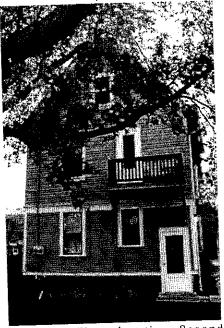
West elevation. Second floor door is not original. All windows are 1-over-1 double hung units. Windows to be replaced at this location.
